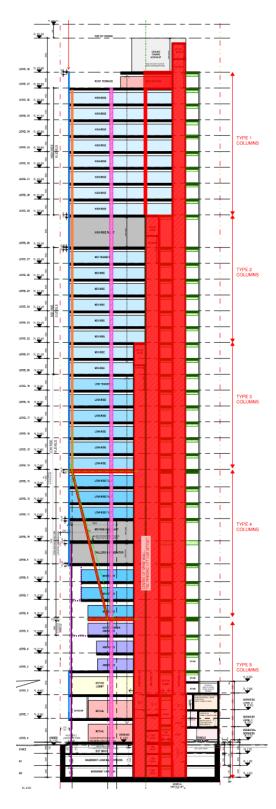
Typical Building Elevations Perpendicular to Albert Street
